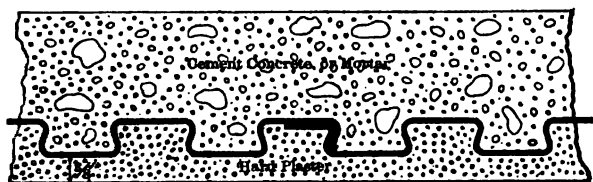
Ferroinclave Reinforcement for Concrete Floors
